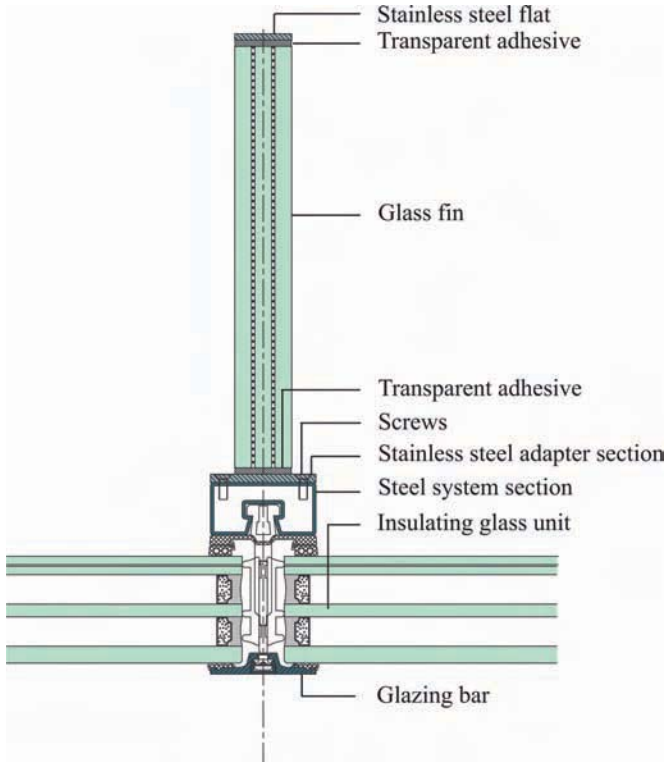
Section through sample facade with hybrid steel-glass beams.
